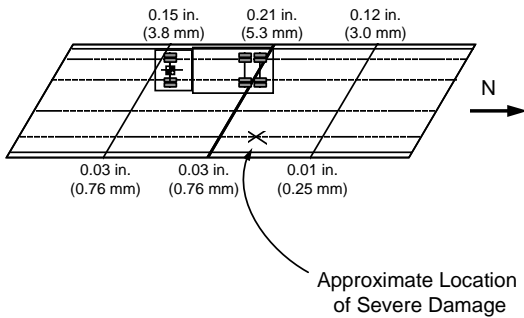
32 Results of north span Load Test #1 — Waelder Bridge
